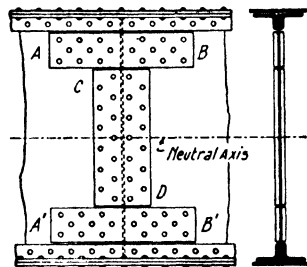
WEB SPLICE FOR PLATE GIRDER.
